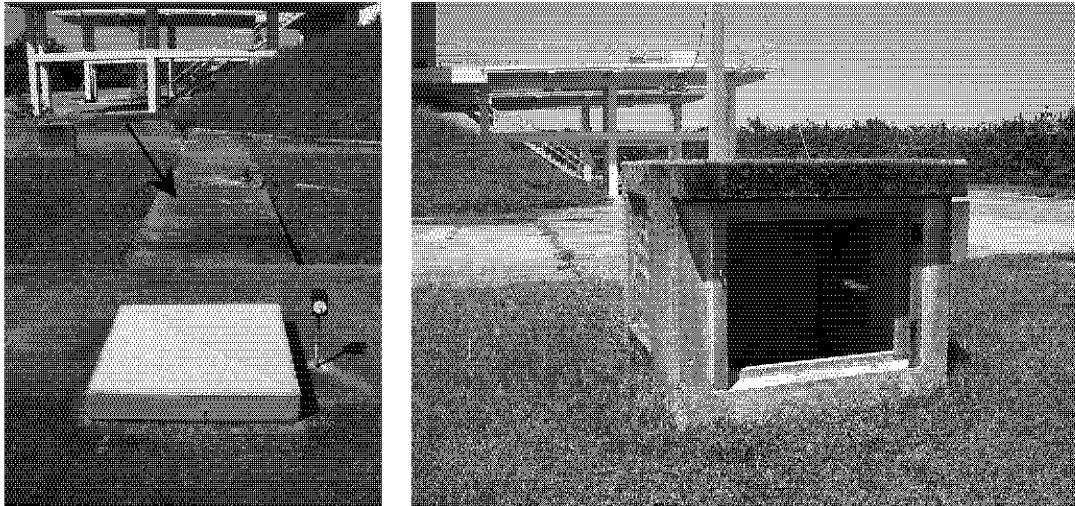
Tunnel from utility room (left); utility tunnel air intake (right) (ERDC-CERL, 2007).
